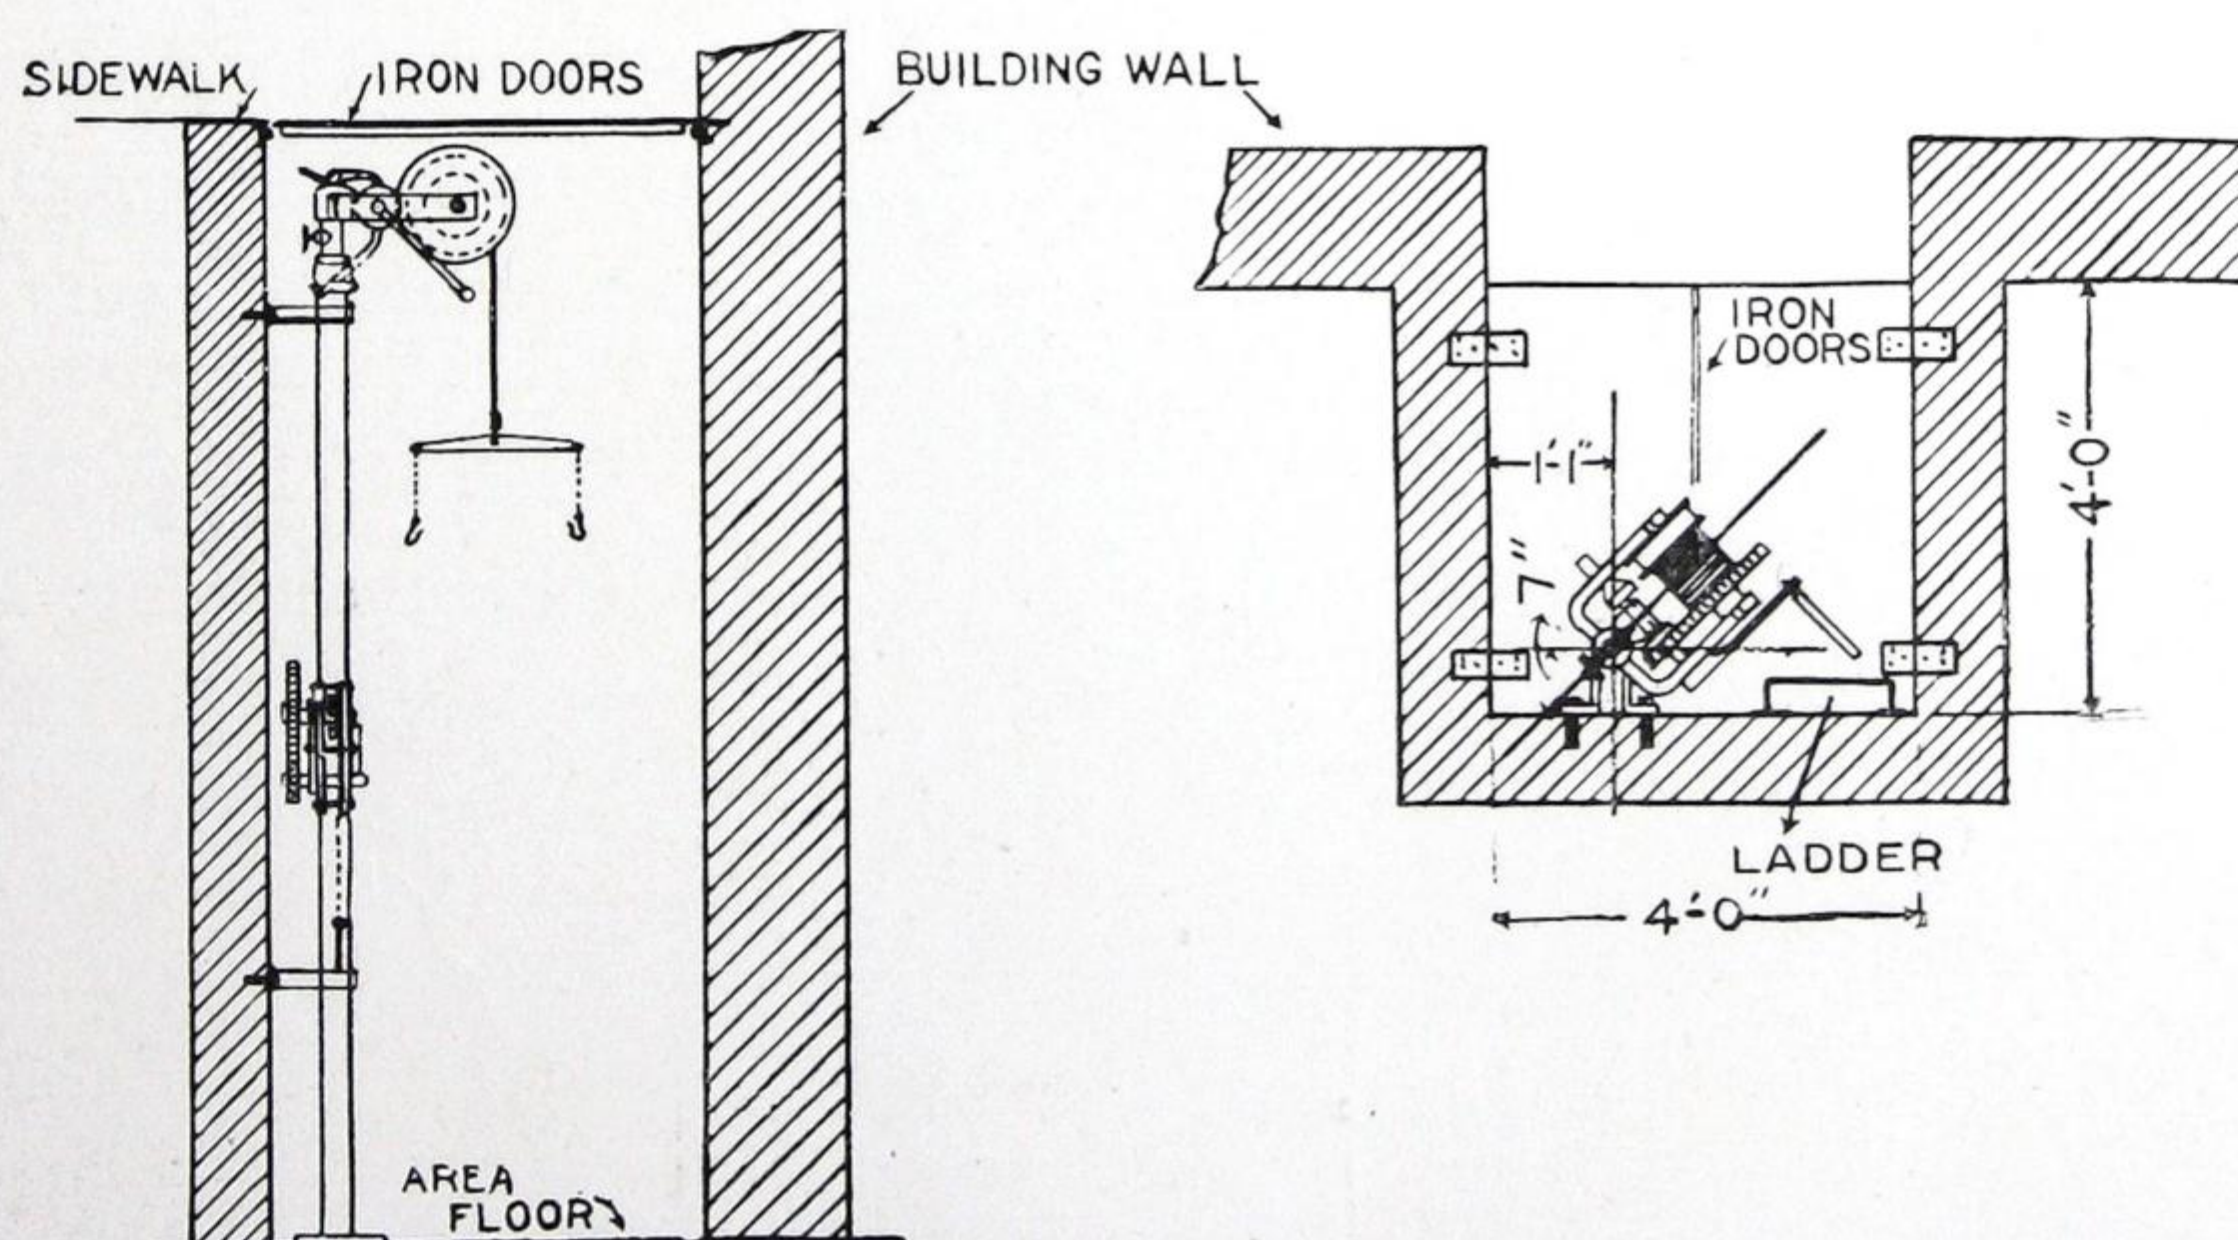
PLAN AND ELEVATION SHOWING ARRANGEMENT OF G. & G. TELESCOPIC HOIST IN AREA OF USUAL SIZE. Note.—Area shown above is large enough for overhead Crane Hoist or Hoist with Electric Motor.
